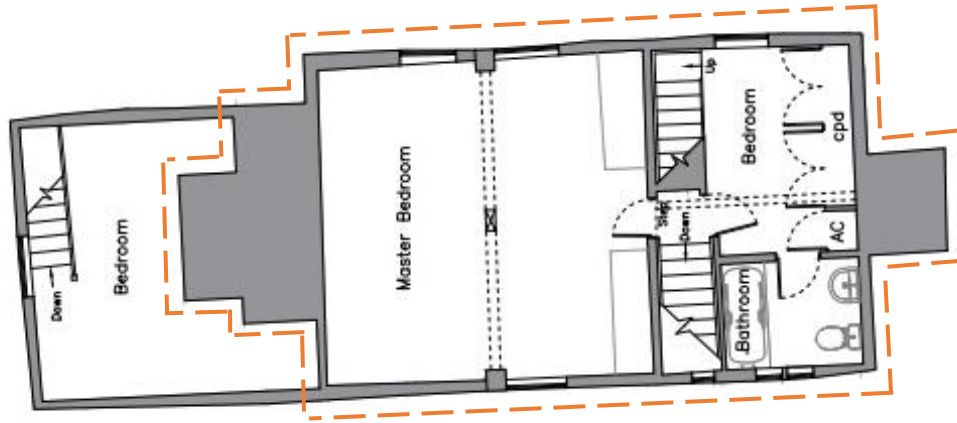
First floor plan highlighting extent of C16 range (Gateley Smithers Purslow)
